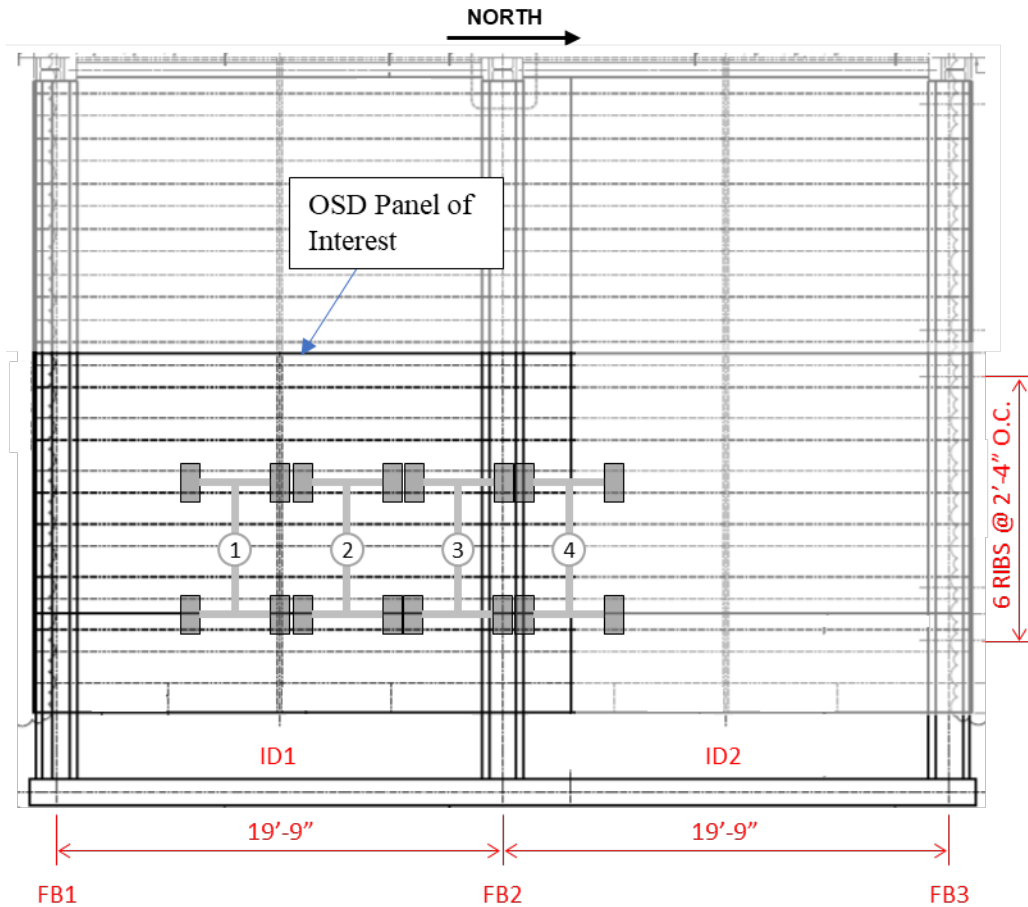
Schematic view of test setup in the ATLSS Center lab for fatigue testing of the full-scale prototype OSD test specimen with EC RFB connection with PJP welds and no internal stiffeners (the loading was applied by Actuators 1 through 4 in sequence)
